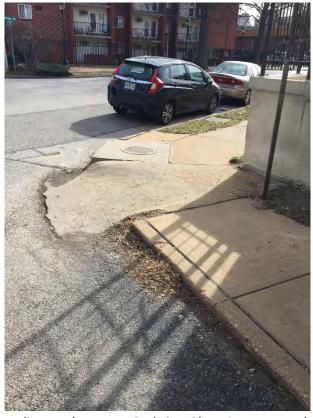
Non ADA compliant curb ramp at Parkview Place Apartments due to proximity to inlet.
